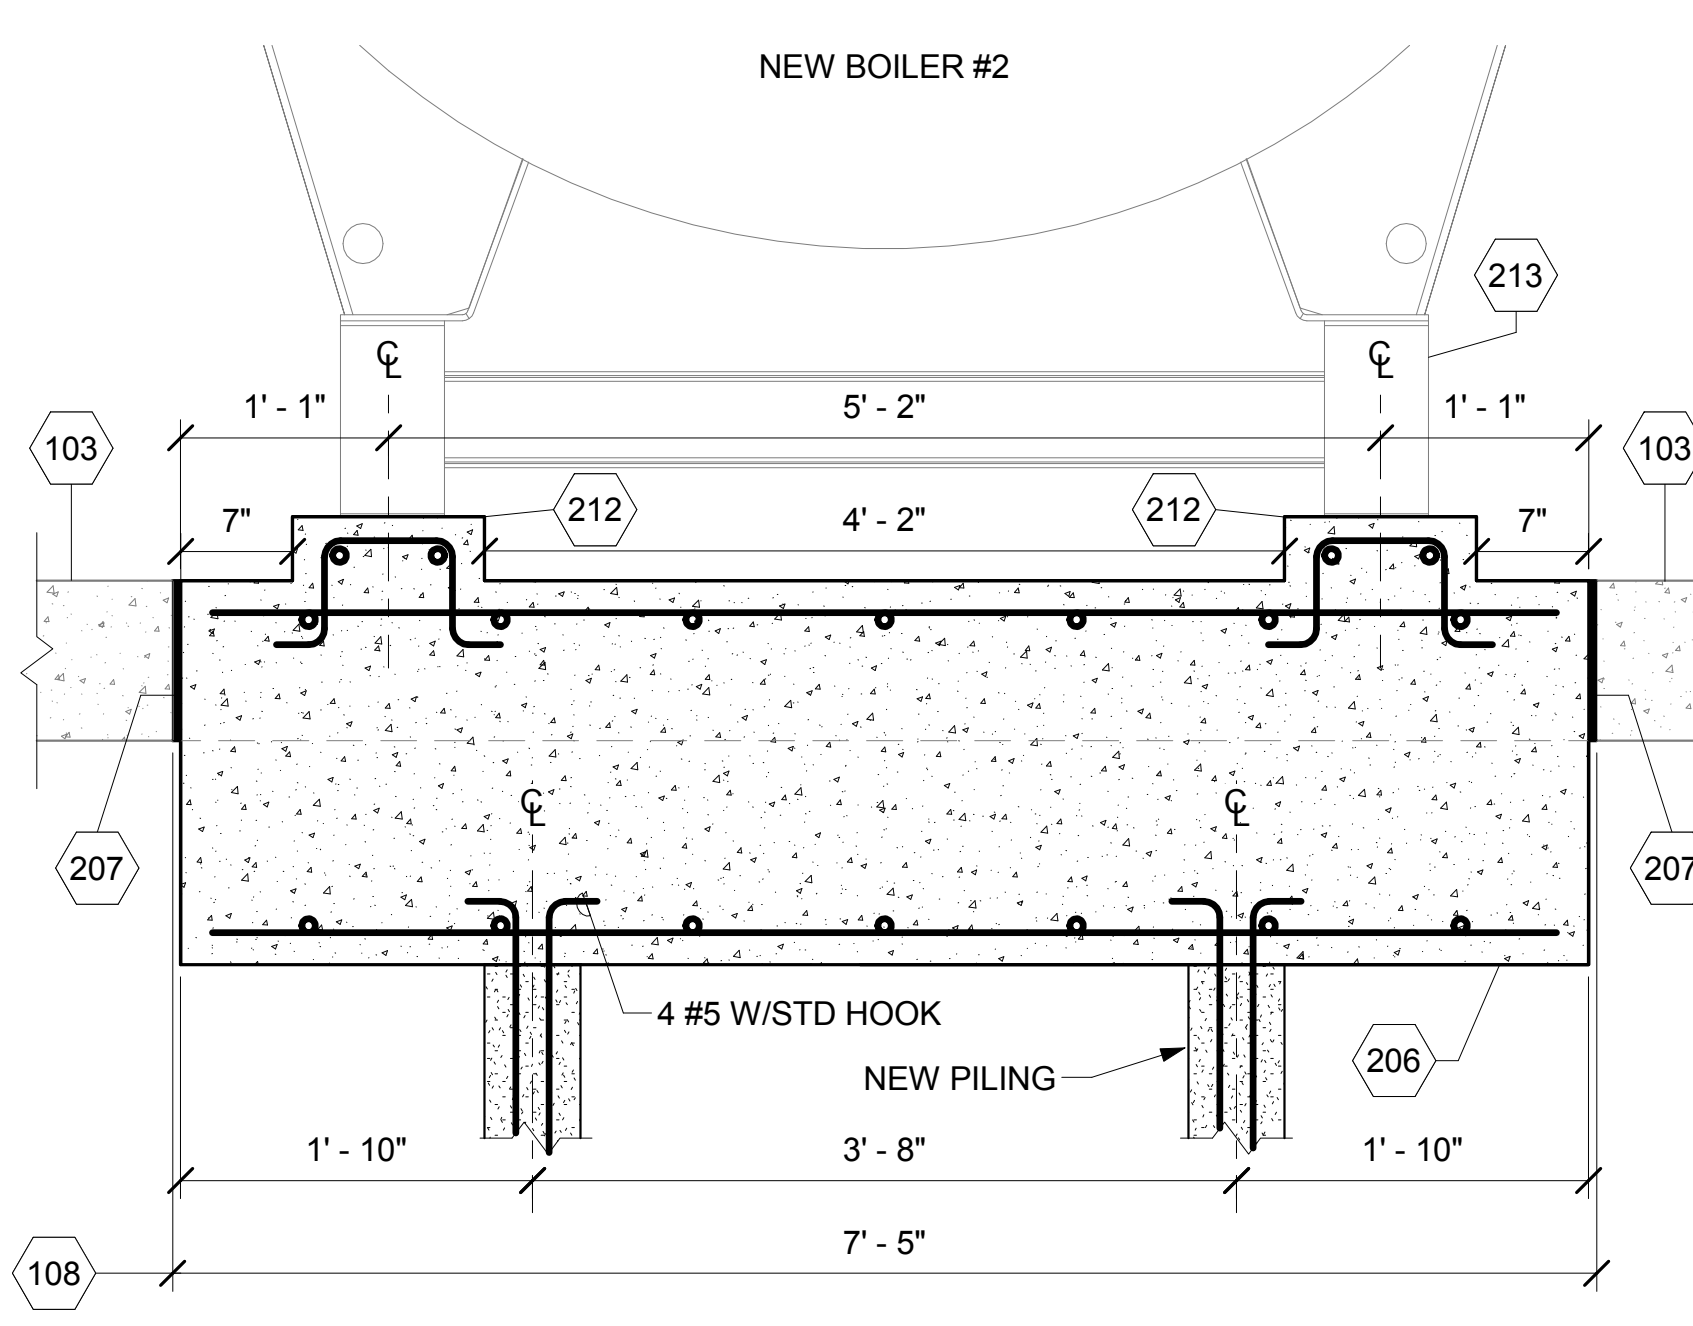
DETAIL - NEW CURB CAST W/ NEW BOILER PAD
